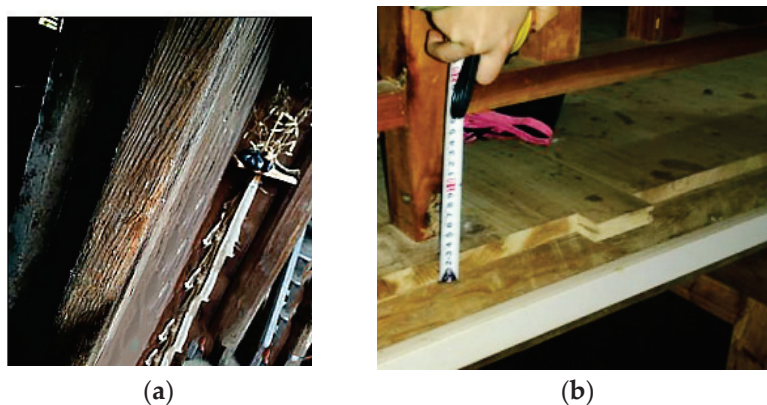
Lightweight construction of traditional dwellings. (a) Chinese fir veneer panels used for walls. (b) Thin floors (20–30 mm) contributing to poor thermal performance.
